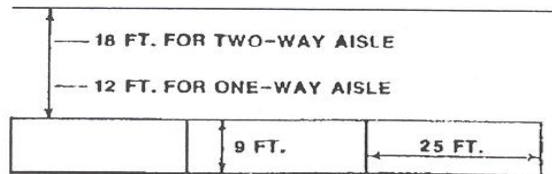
OFF-STREET PARKING SPACE AND MANEUVERING AISLE DESIGN STANDARDS
